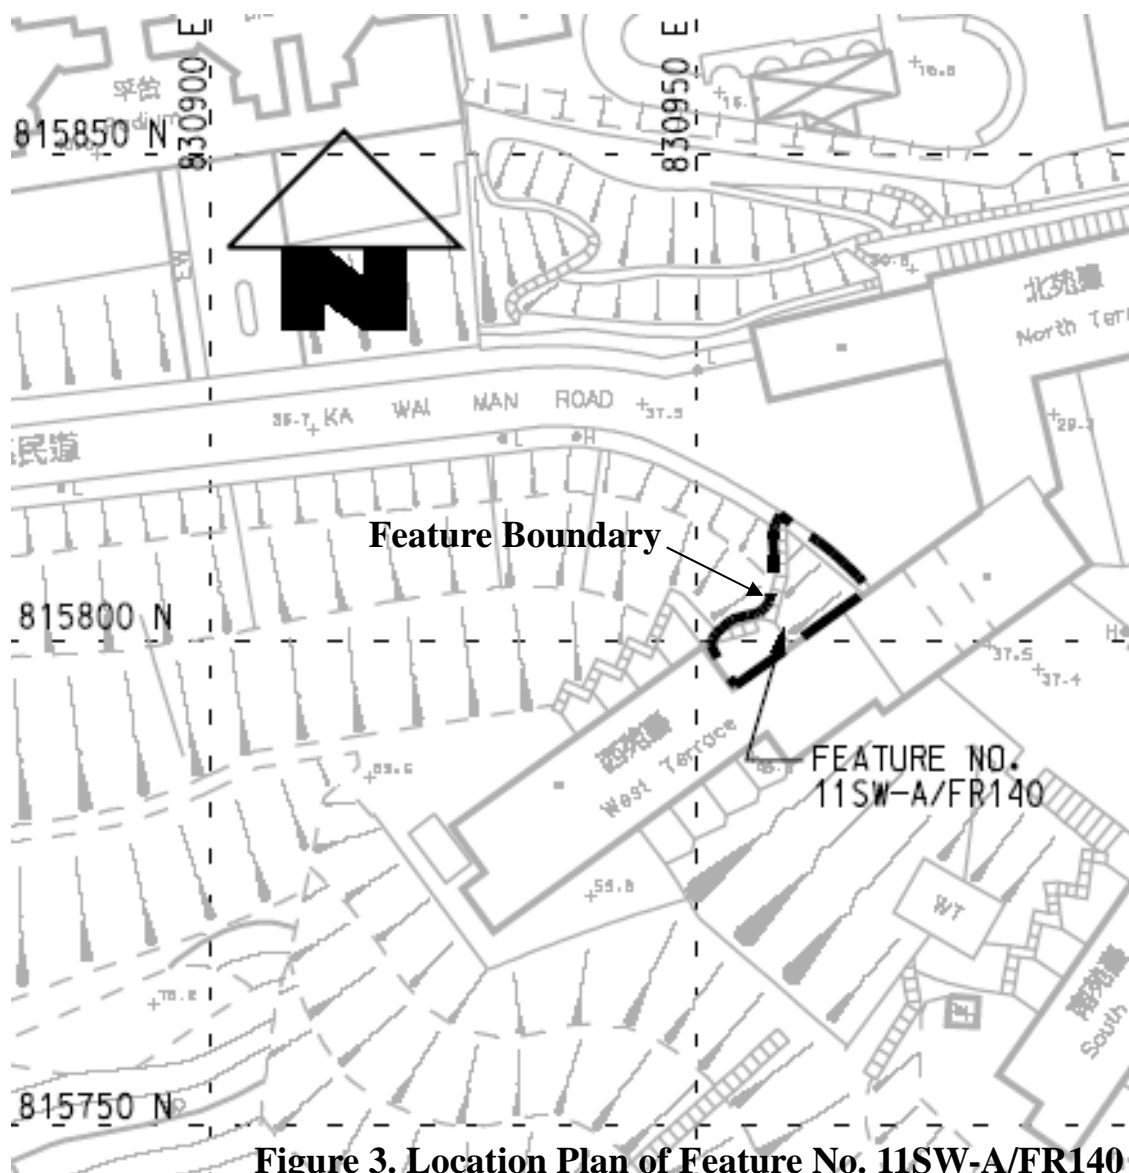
Location Plan of Feature No. 11SW-A/FR140
